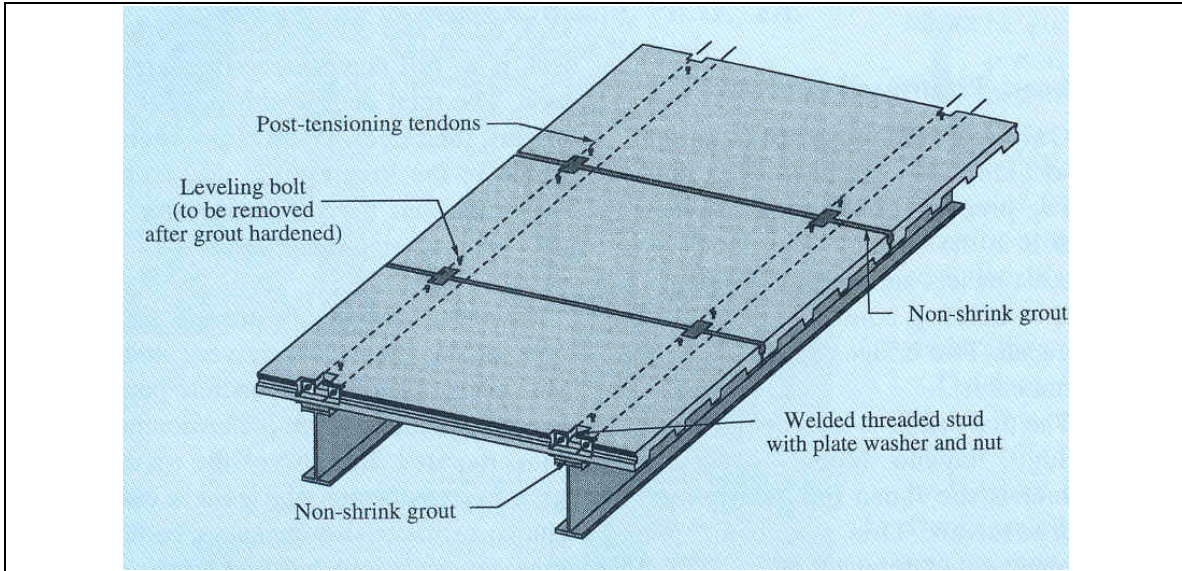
Full-depth precast, prestressed deck system (Yamane et al., 1998)
